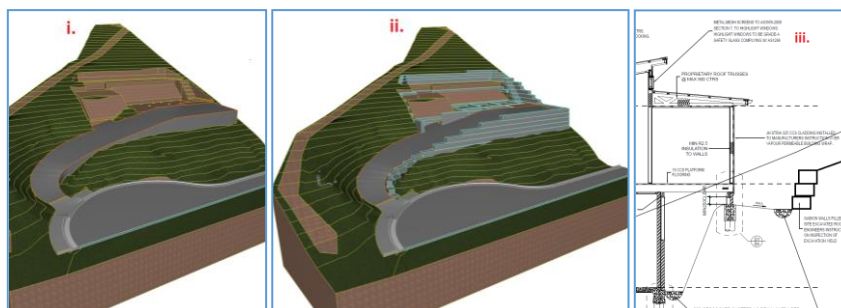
i.) Visualised BIM model of a cut-and-fill option ii.) BIM model of the footings and the retaining walls (Created by: F. Acs) iii.) 2D Section and details of the upper level Gabion retaining walls and the building (Designed and drafted by: DWDD)
